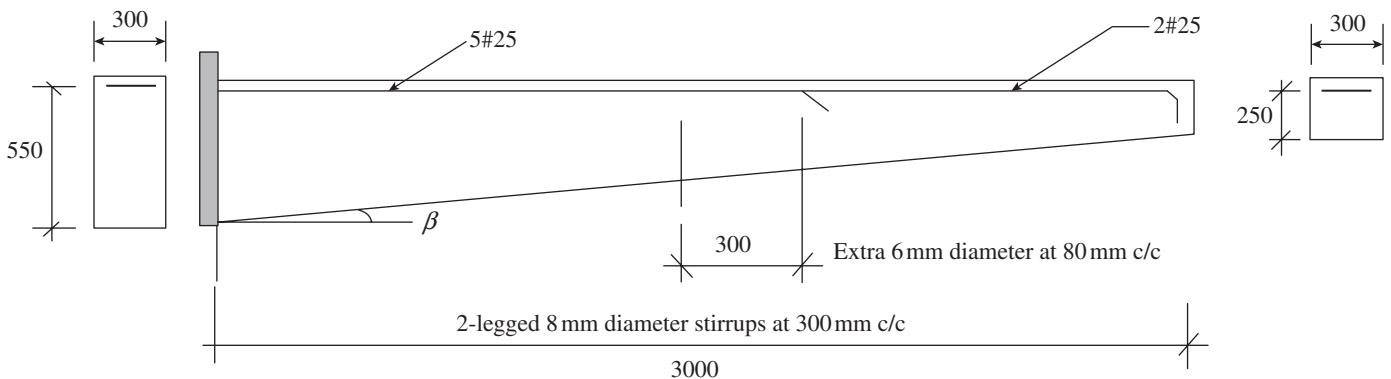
Details of shear reinforcement for cantilever beam of Example 6.6
